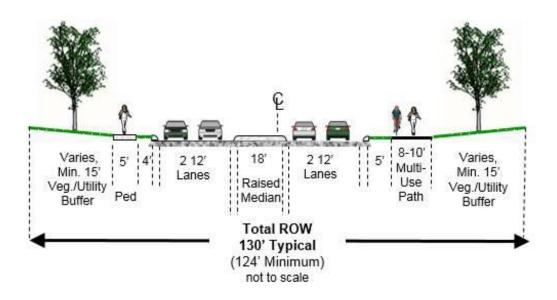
Typical Cross-Sections—Major Arterials
